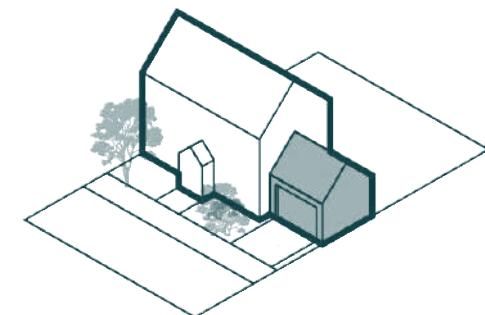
Illustrative diagram showing an indicative layout of on-plot garage parking
